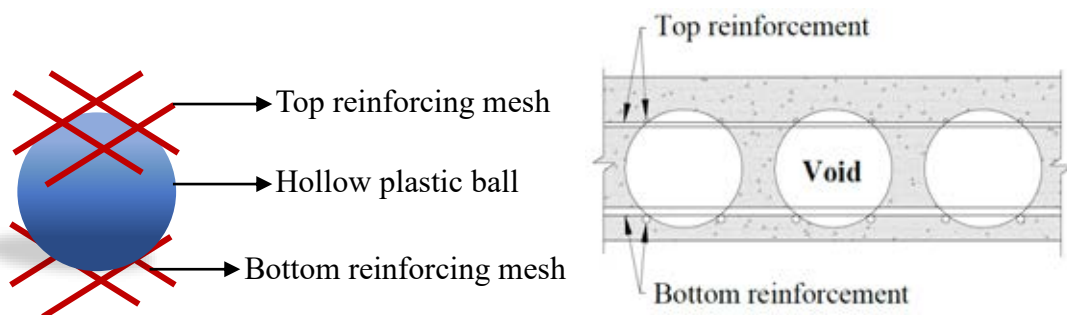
Components of Two-way Voided Slab and Typical Cross-section
